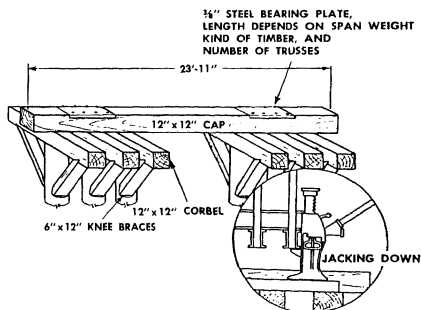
Construction of pile caps for intermediate supports under panel bridges without end posts or bearings. Corbels and knee bracing added to provide a jacking platform for light bridges.
